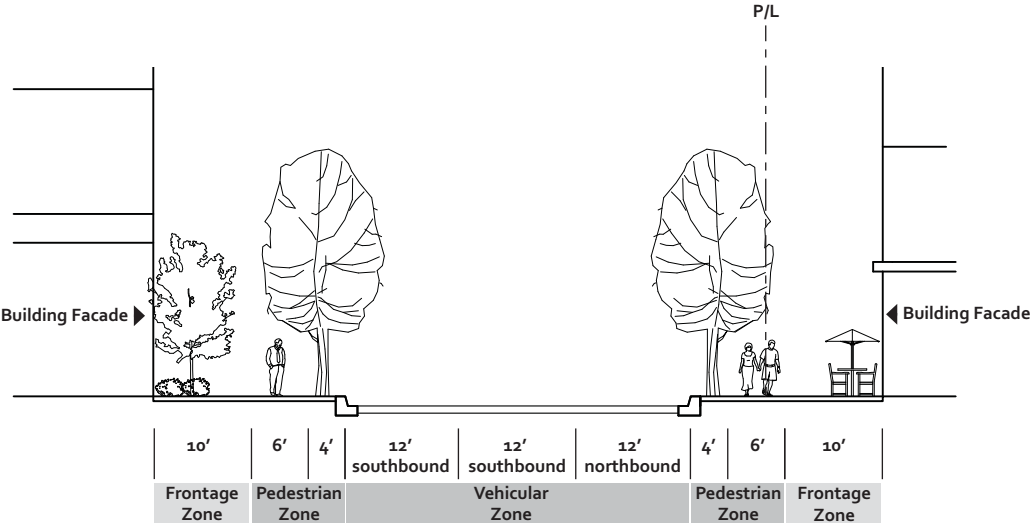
Asian Garden Mall Drive South (with Parking) Section
